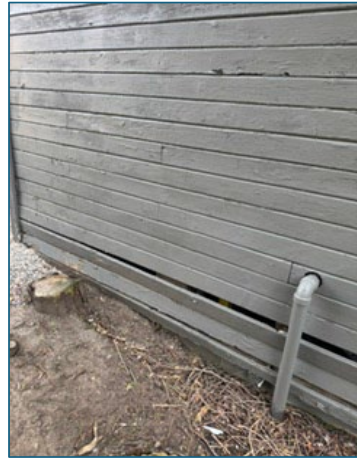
Garafraxa Street E, Fergus – Carriage House
